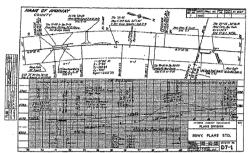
Typical shoot of plans for a 2-lane rural highway (Courtesty Arisons Highway Department)
